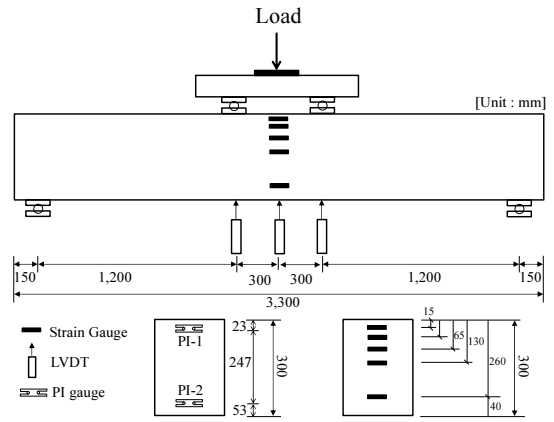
Instrumentation used for the beam flexural test(unit: mm)
